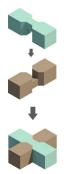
WangJji cross joint. This is the WangJji cross joint, which joins two members by intersecting them.
